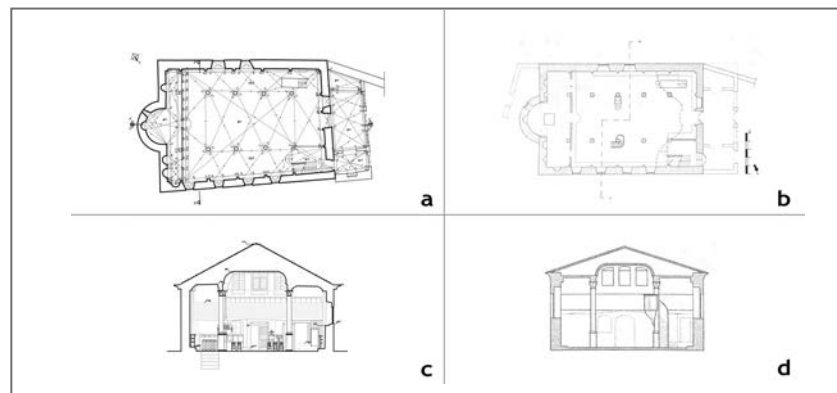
A comparison of our survey data with the previously published data: a. Our ground floor plan, b. The ground floor plan in Zafer Karaca's book, c. Our cross-section, d. The cross-section in Zafer Karaca's book.
